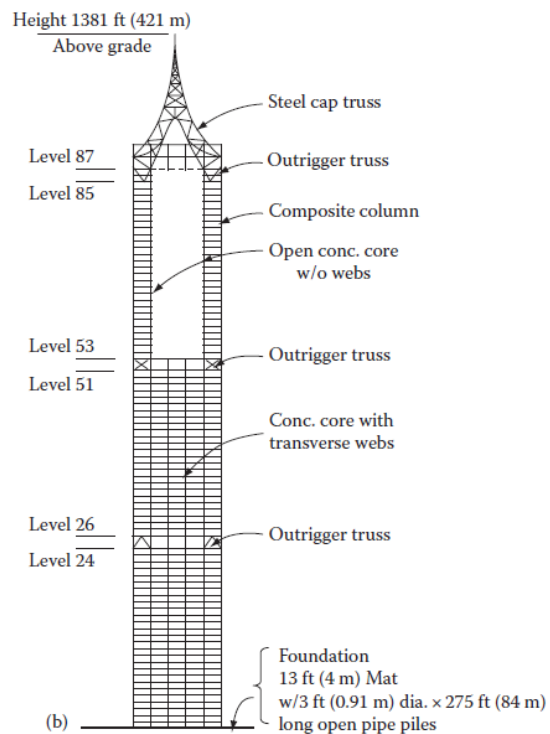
Jin Mao Tower – Elevation View: Structural System (Taranath, 2011)
